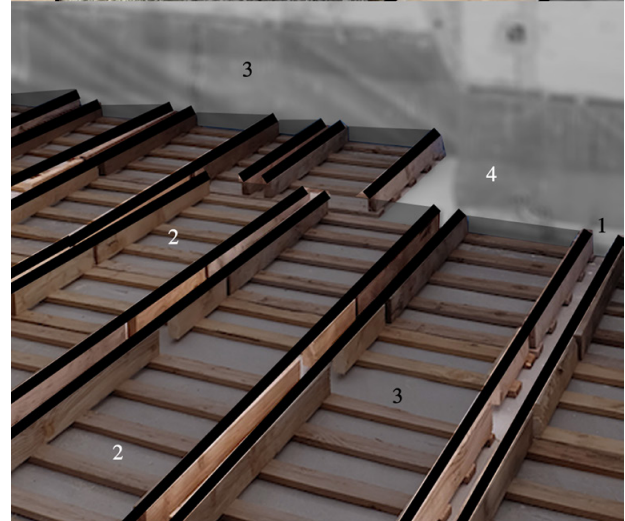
| Analytical diagrams of a roof enclosure: structure of recycled pallets or wooden slats (1), filling with PO (2), after forming slopes (3) and waterproofing (4) (credit: author, 2025).
